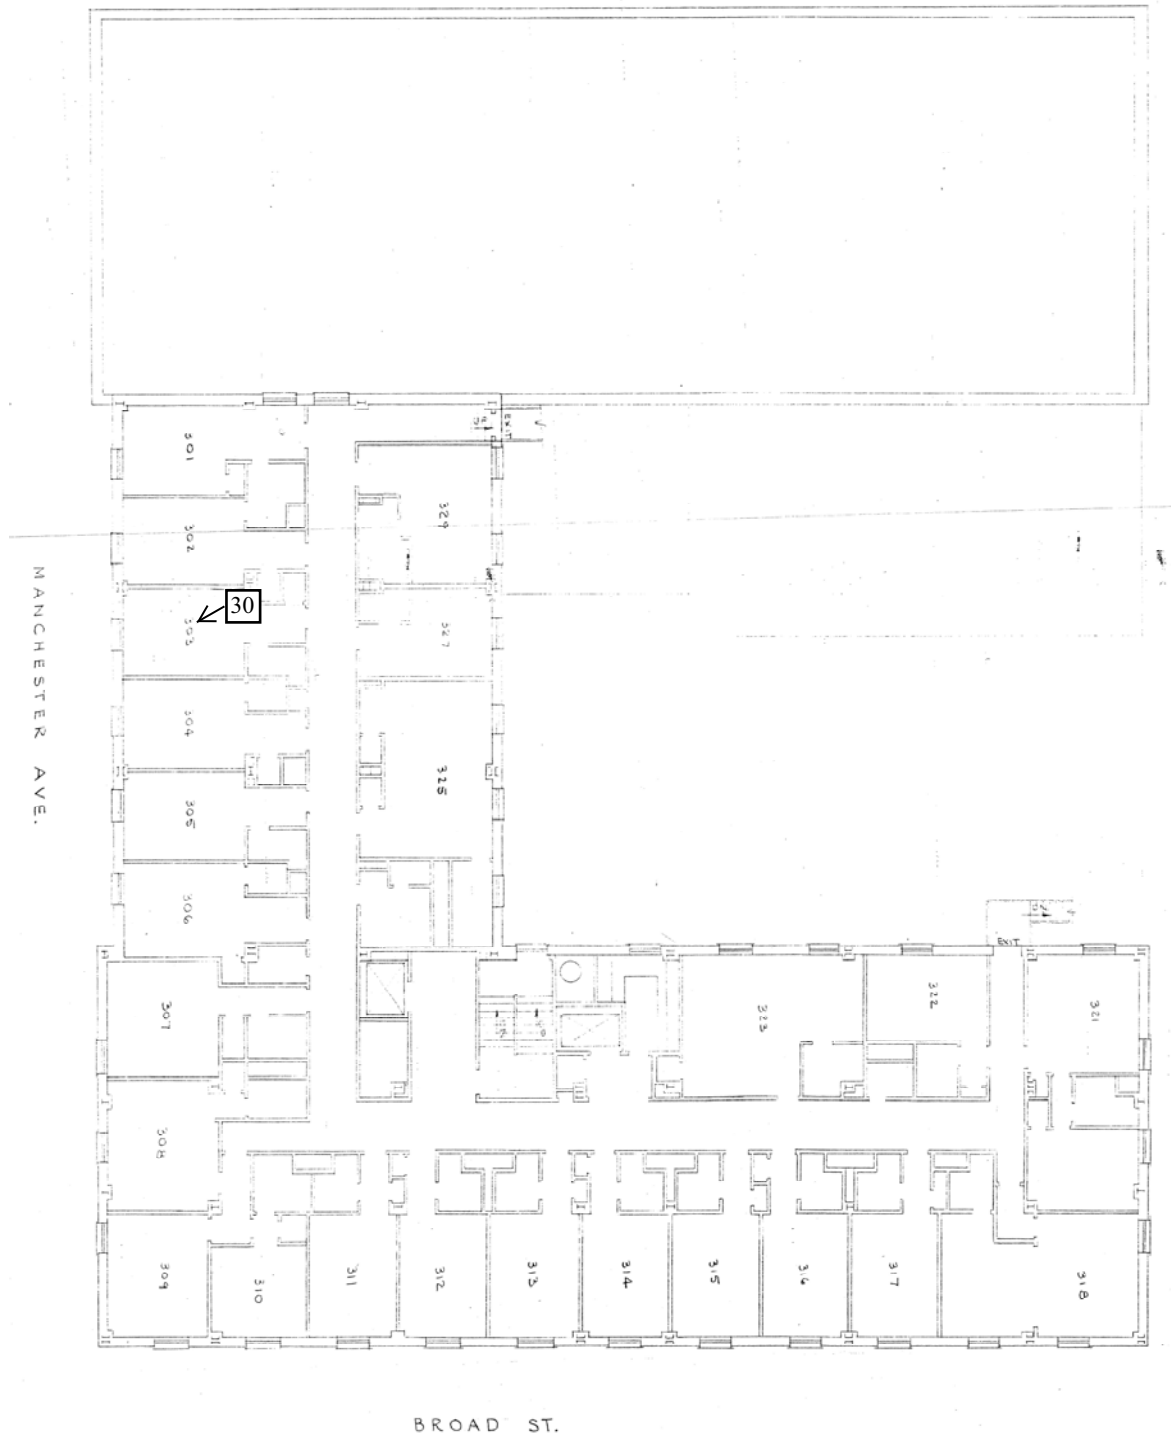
Floor plan of Third Floor of the Hotel Manchester in Middletown, Ohio with photo locations
